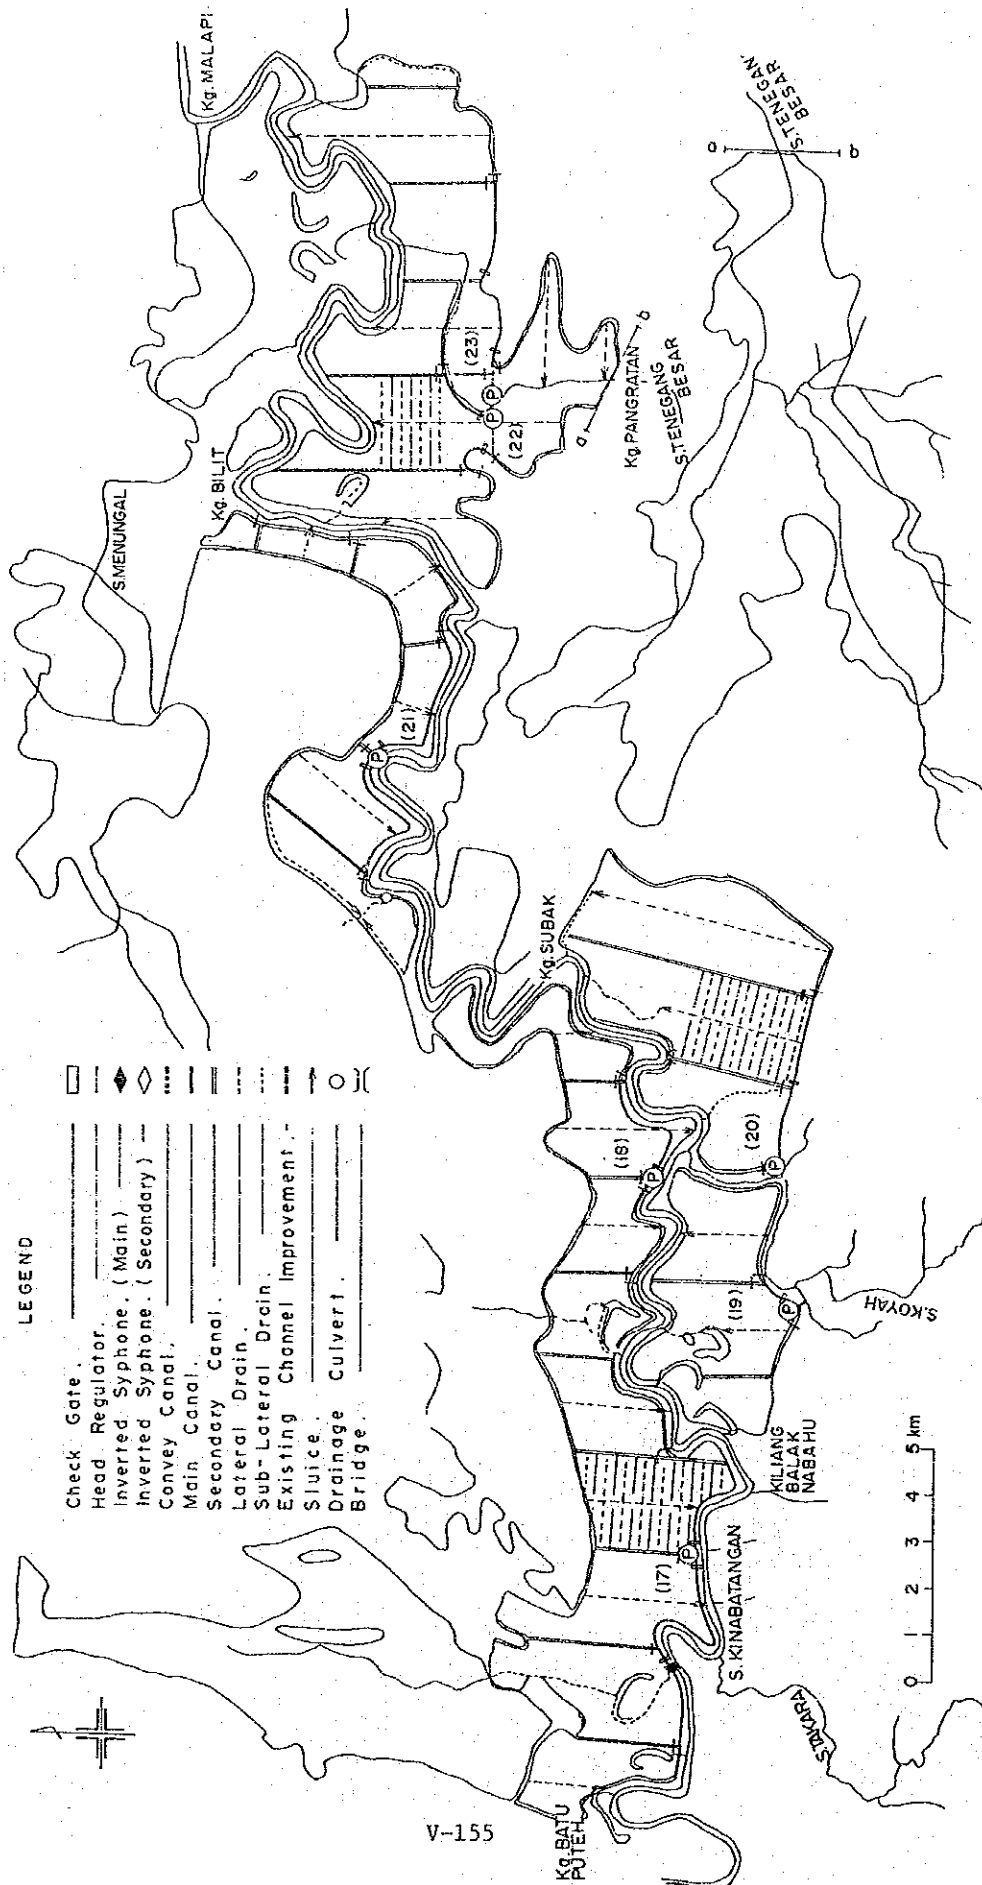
(3) GENERAL PLAN OF DEVELOPMENT AREA
